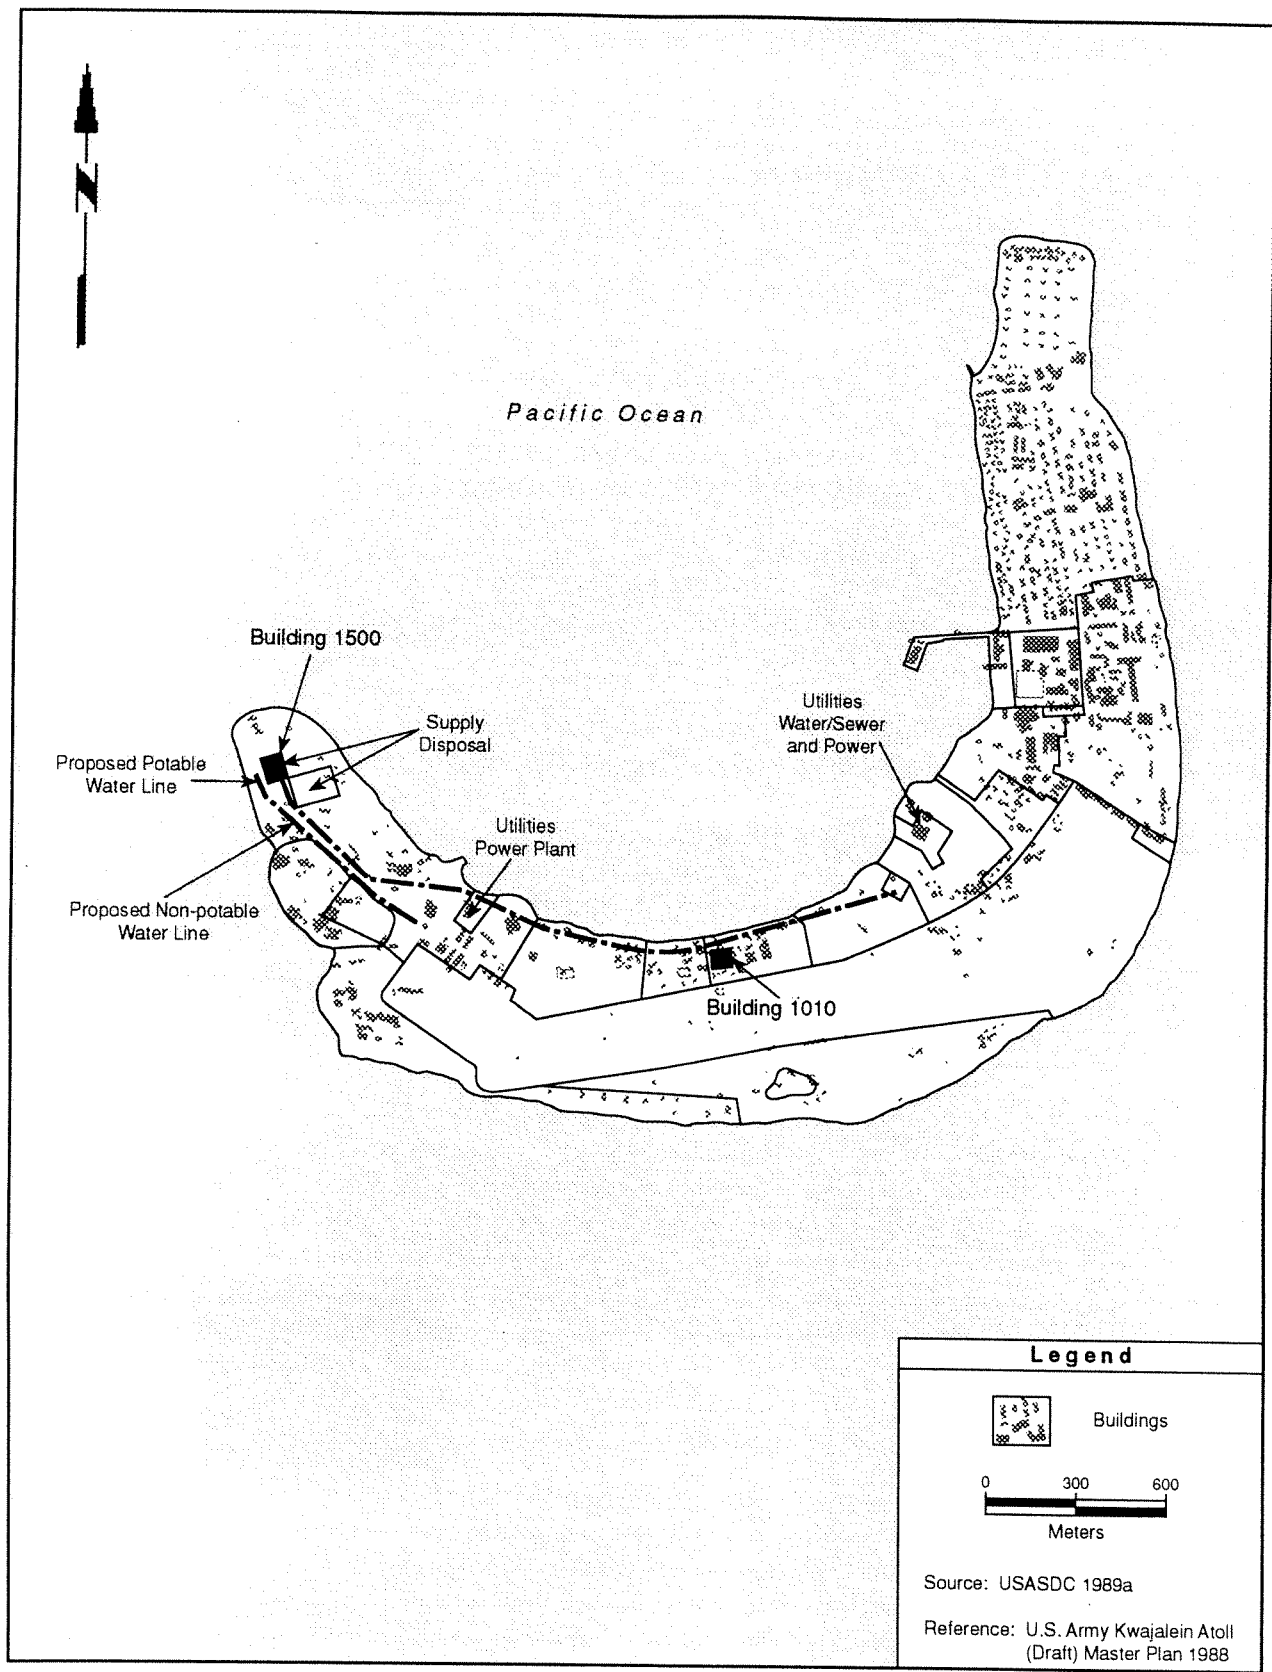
New water and power lines to Building 1500, for ground based radar, Kwajalein Island, USAKA
